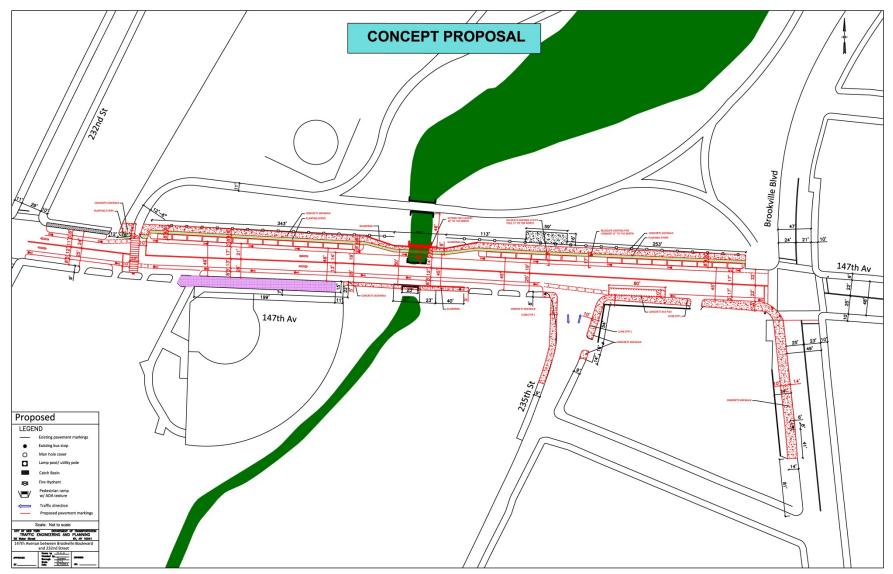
147th Avenue between Brookville Boulevard & 232nd Street – Proposal
